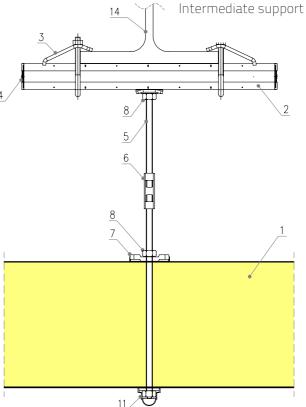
IzoCold PIR/PIR+ - suspending cold storage panels with the use of HILTI system
